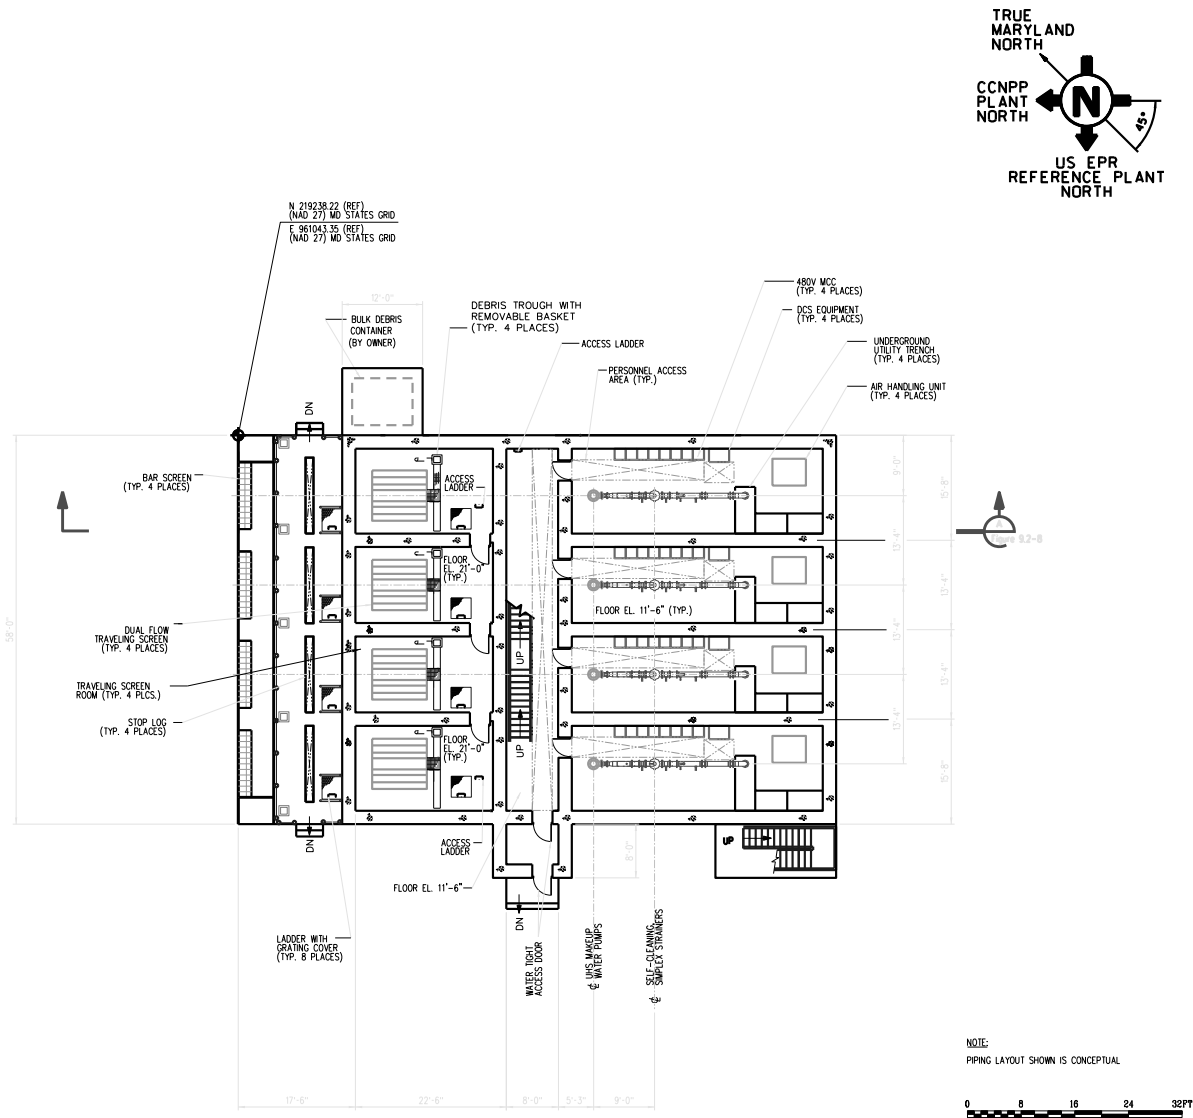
{UHS Makeup Water Intake Structure - Plan View at Elevation 26'- 6"}
